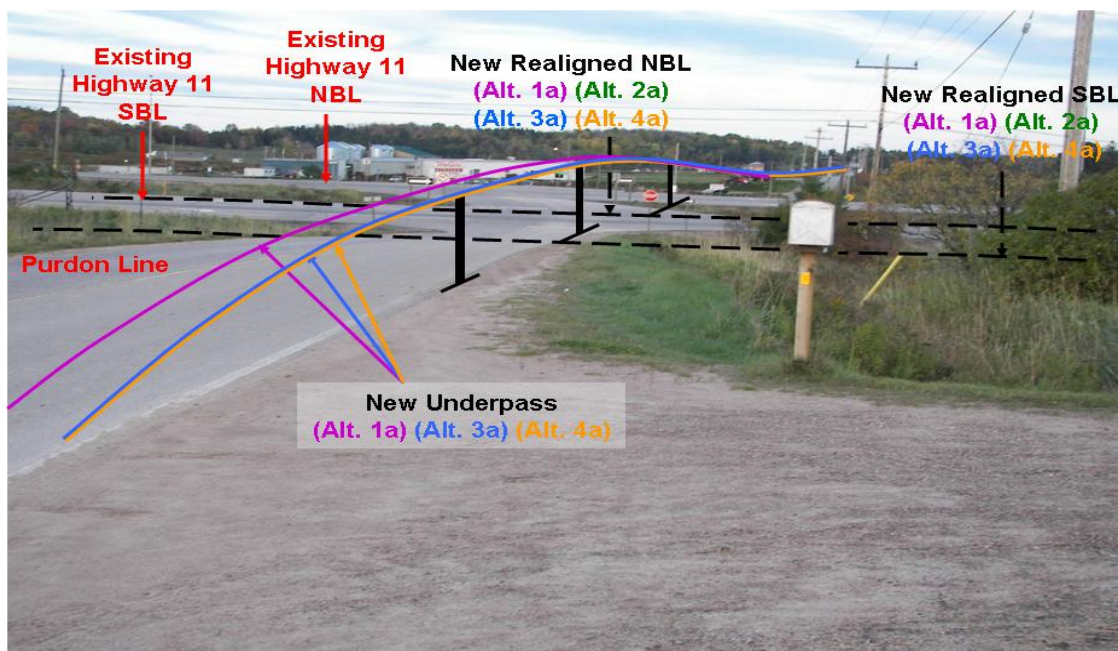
Looking south east from 80 m west of Purdon Line intersection at low lying terrain and unnamed tributary of McGillvray Creek crossing. The existing SBL embankment is up to 6m high. (Oct. 16, 2007)
